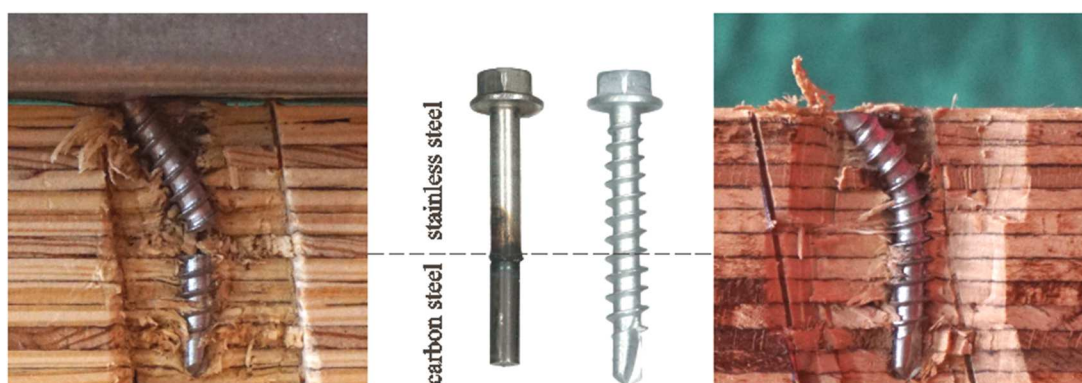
Screw failure of screw 1. Left: Failure in LVL-X. Centre: Position of the transition area between carbon steel and stainless steel in screw 1. Right: Failure in BB.
